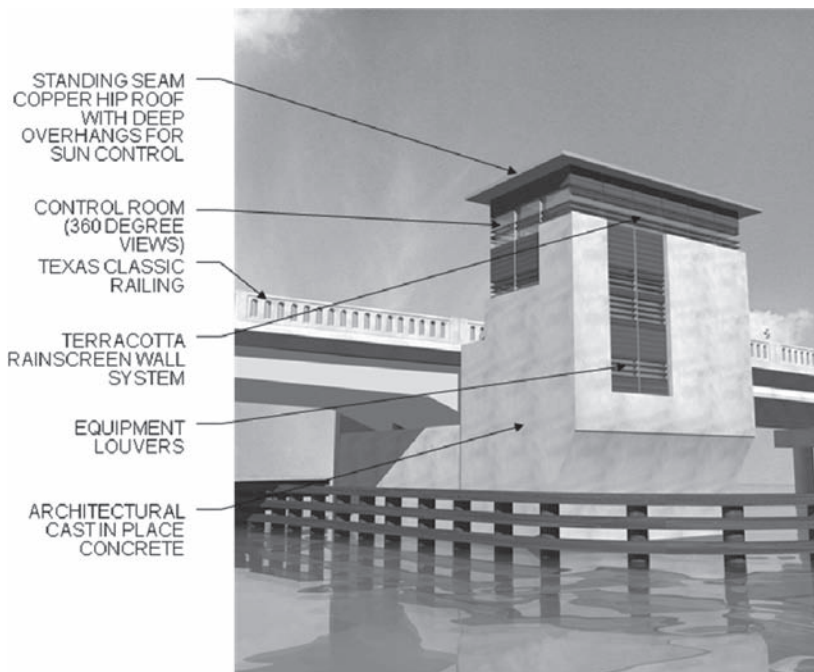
Details of proposed bridge control house (HNTB, 2007).
